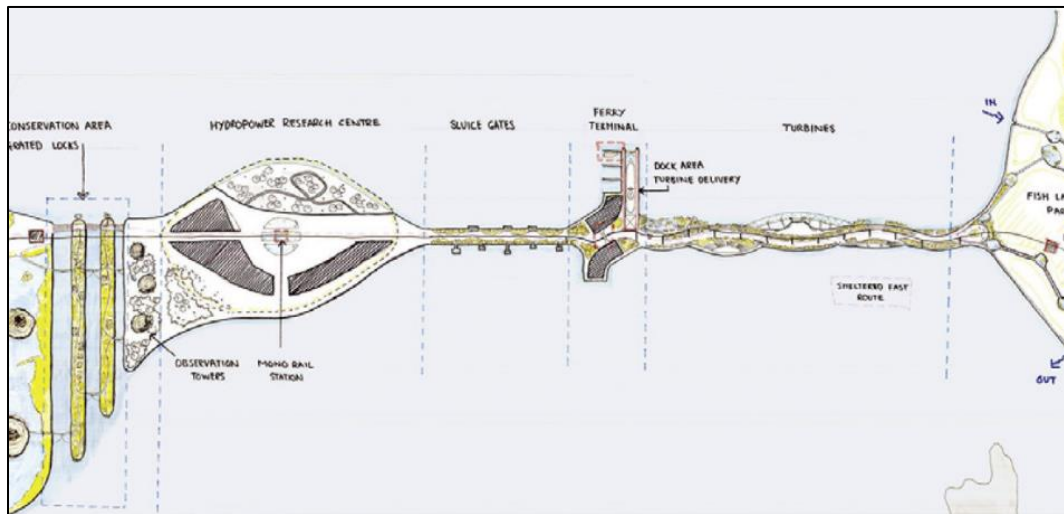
Proposed layout for Mersey tidal barrage (Petley et al., 2019).
